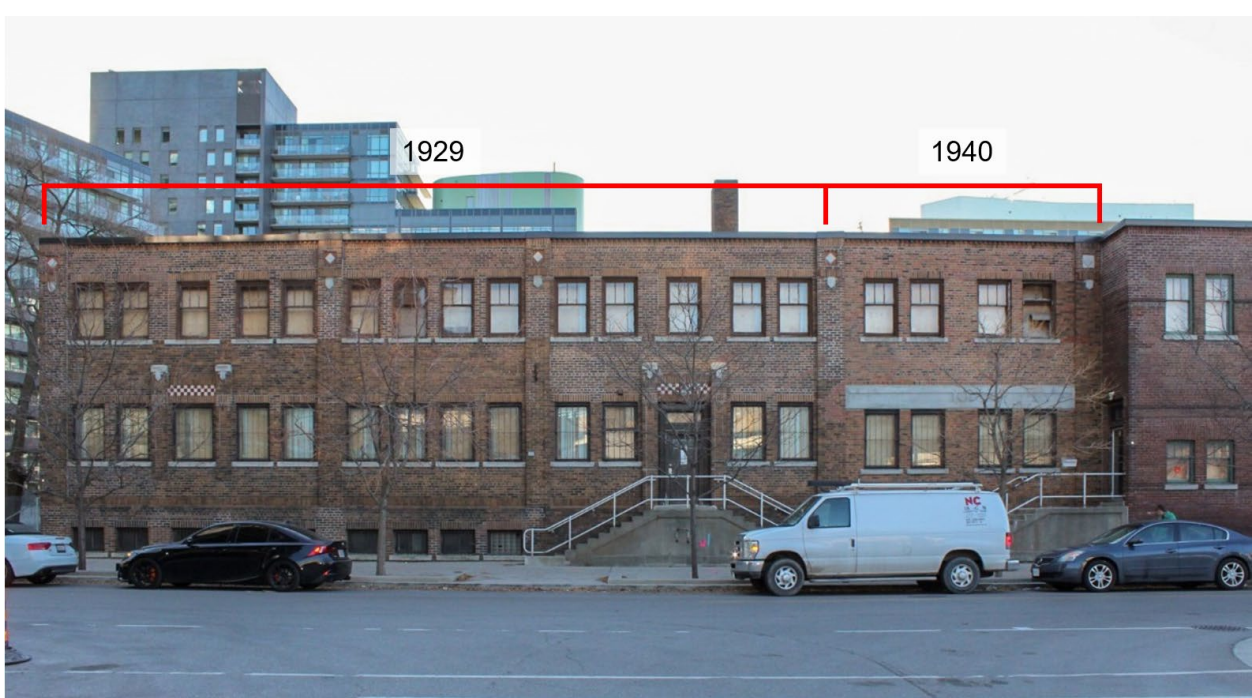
The north elevation of 171 Eastern Avenue, prior to demolition in 2021, with annotations to indicate the dates of construction of the original building and the 1941 addition. (SBA Ltd. 2021; annotations by Heritage Planning)
